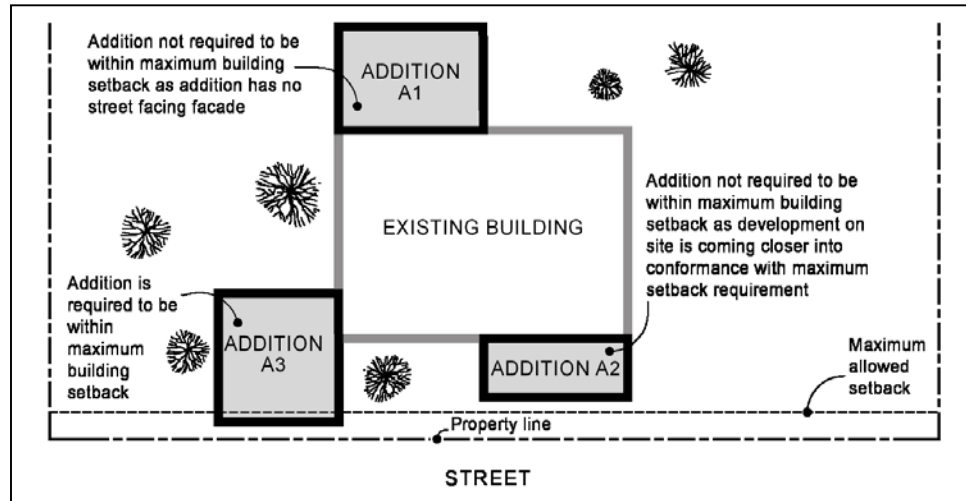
is being revised to show that additions that are next to (rather than in front of or behind an existing building) must meet the maximum setback for 100 percent of its street facing façade until the total building façade (existing and addition) meet the 50 percent standard. The existing figure is shown below. Addition 3 shows the situation where an addition creates additional street frontage. In that case, the addition must meet the maximum transit setback for its entire length. Once the overall street frontage meets the applicable standard - 1 or 2
